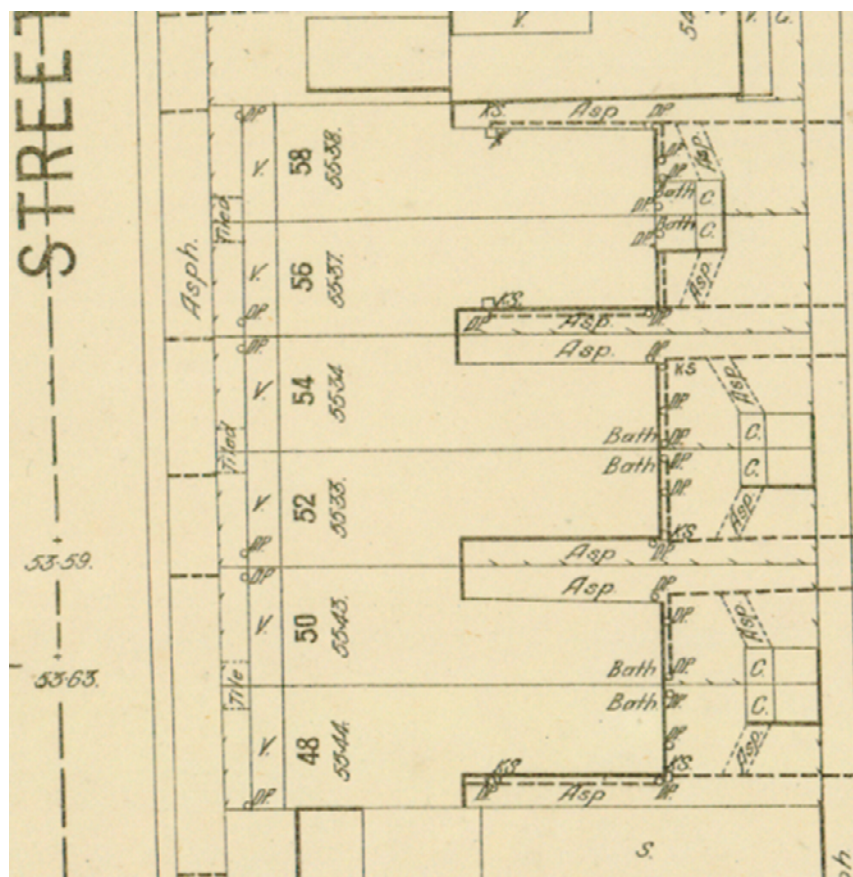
MMBW Detail Plan no. 964, dated 1896 (source: SLV).
